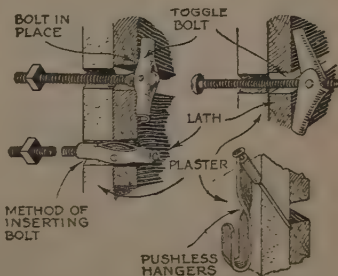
Toggle bolts for use in hollow walls; a small wall hook.
